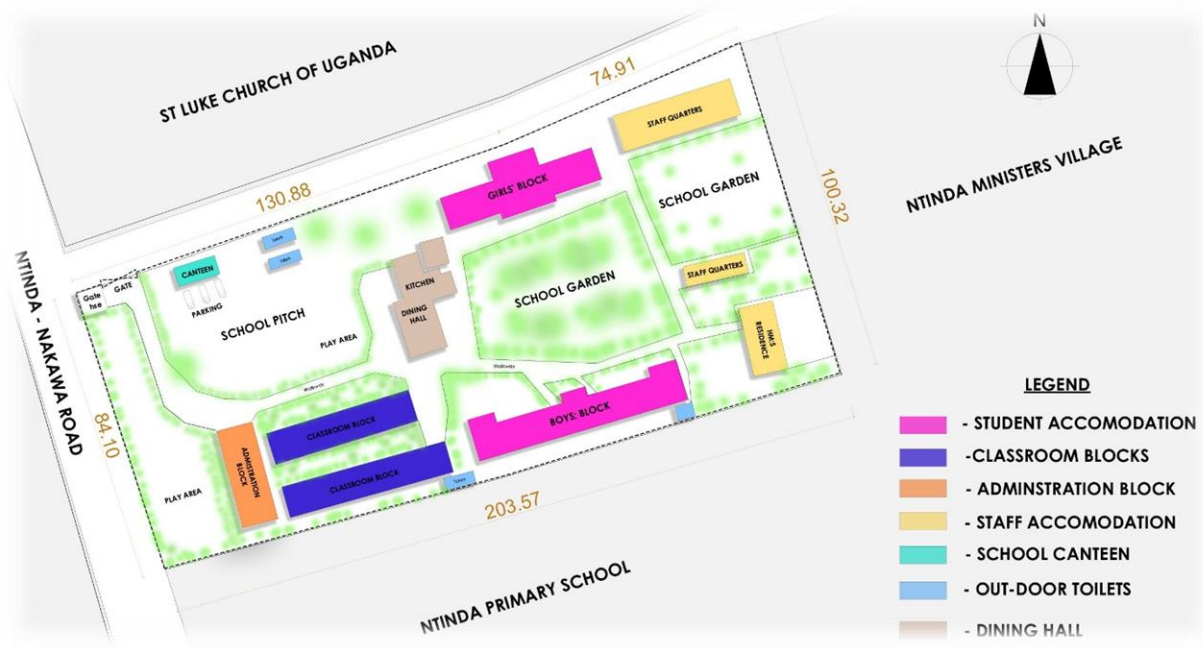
Site plan of Ntinda School for the deaf showing the built structures. Source Google earth – Author edited, 2021
